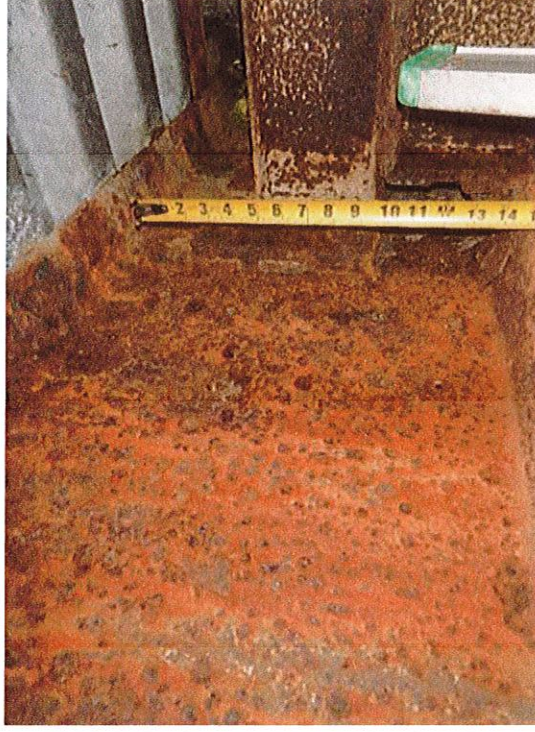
SPAN 1, WEST GIRDER, NEAR BENT 1: Heavy pitting with section loss for 7' length (9" height x 1/8" deep)
